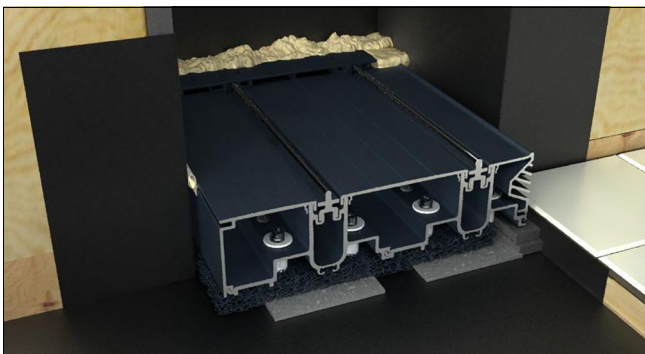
Open face slot with concrete construction. Slot recess is 3/8" (10). Available flooring is 2" (51) however 3/4" (19) hardwood flooring is used leaving 1 1/4" (32) sill face exposed.
